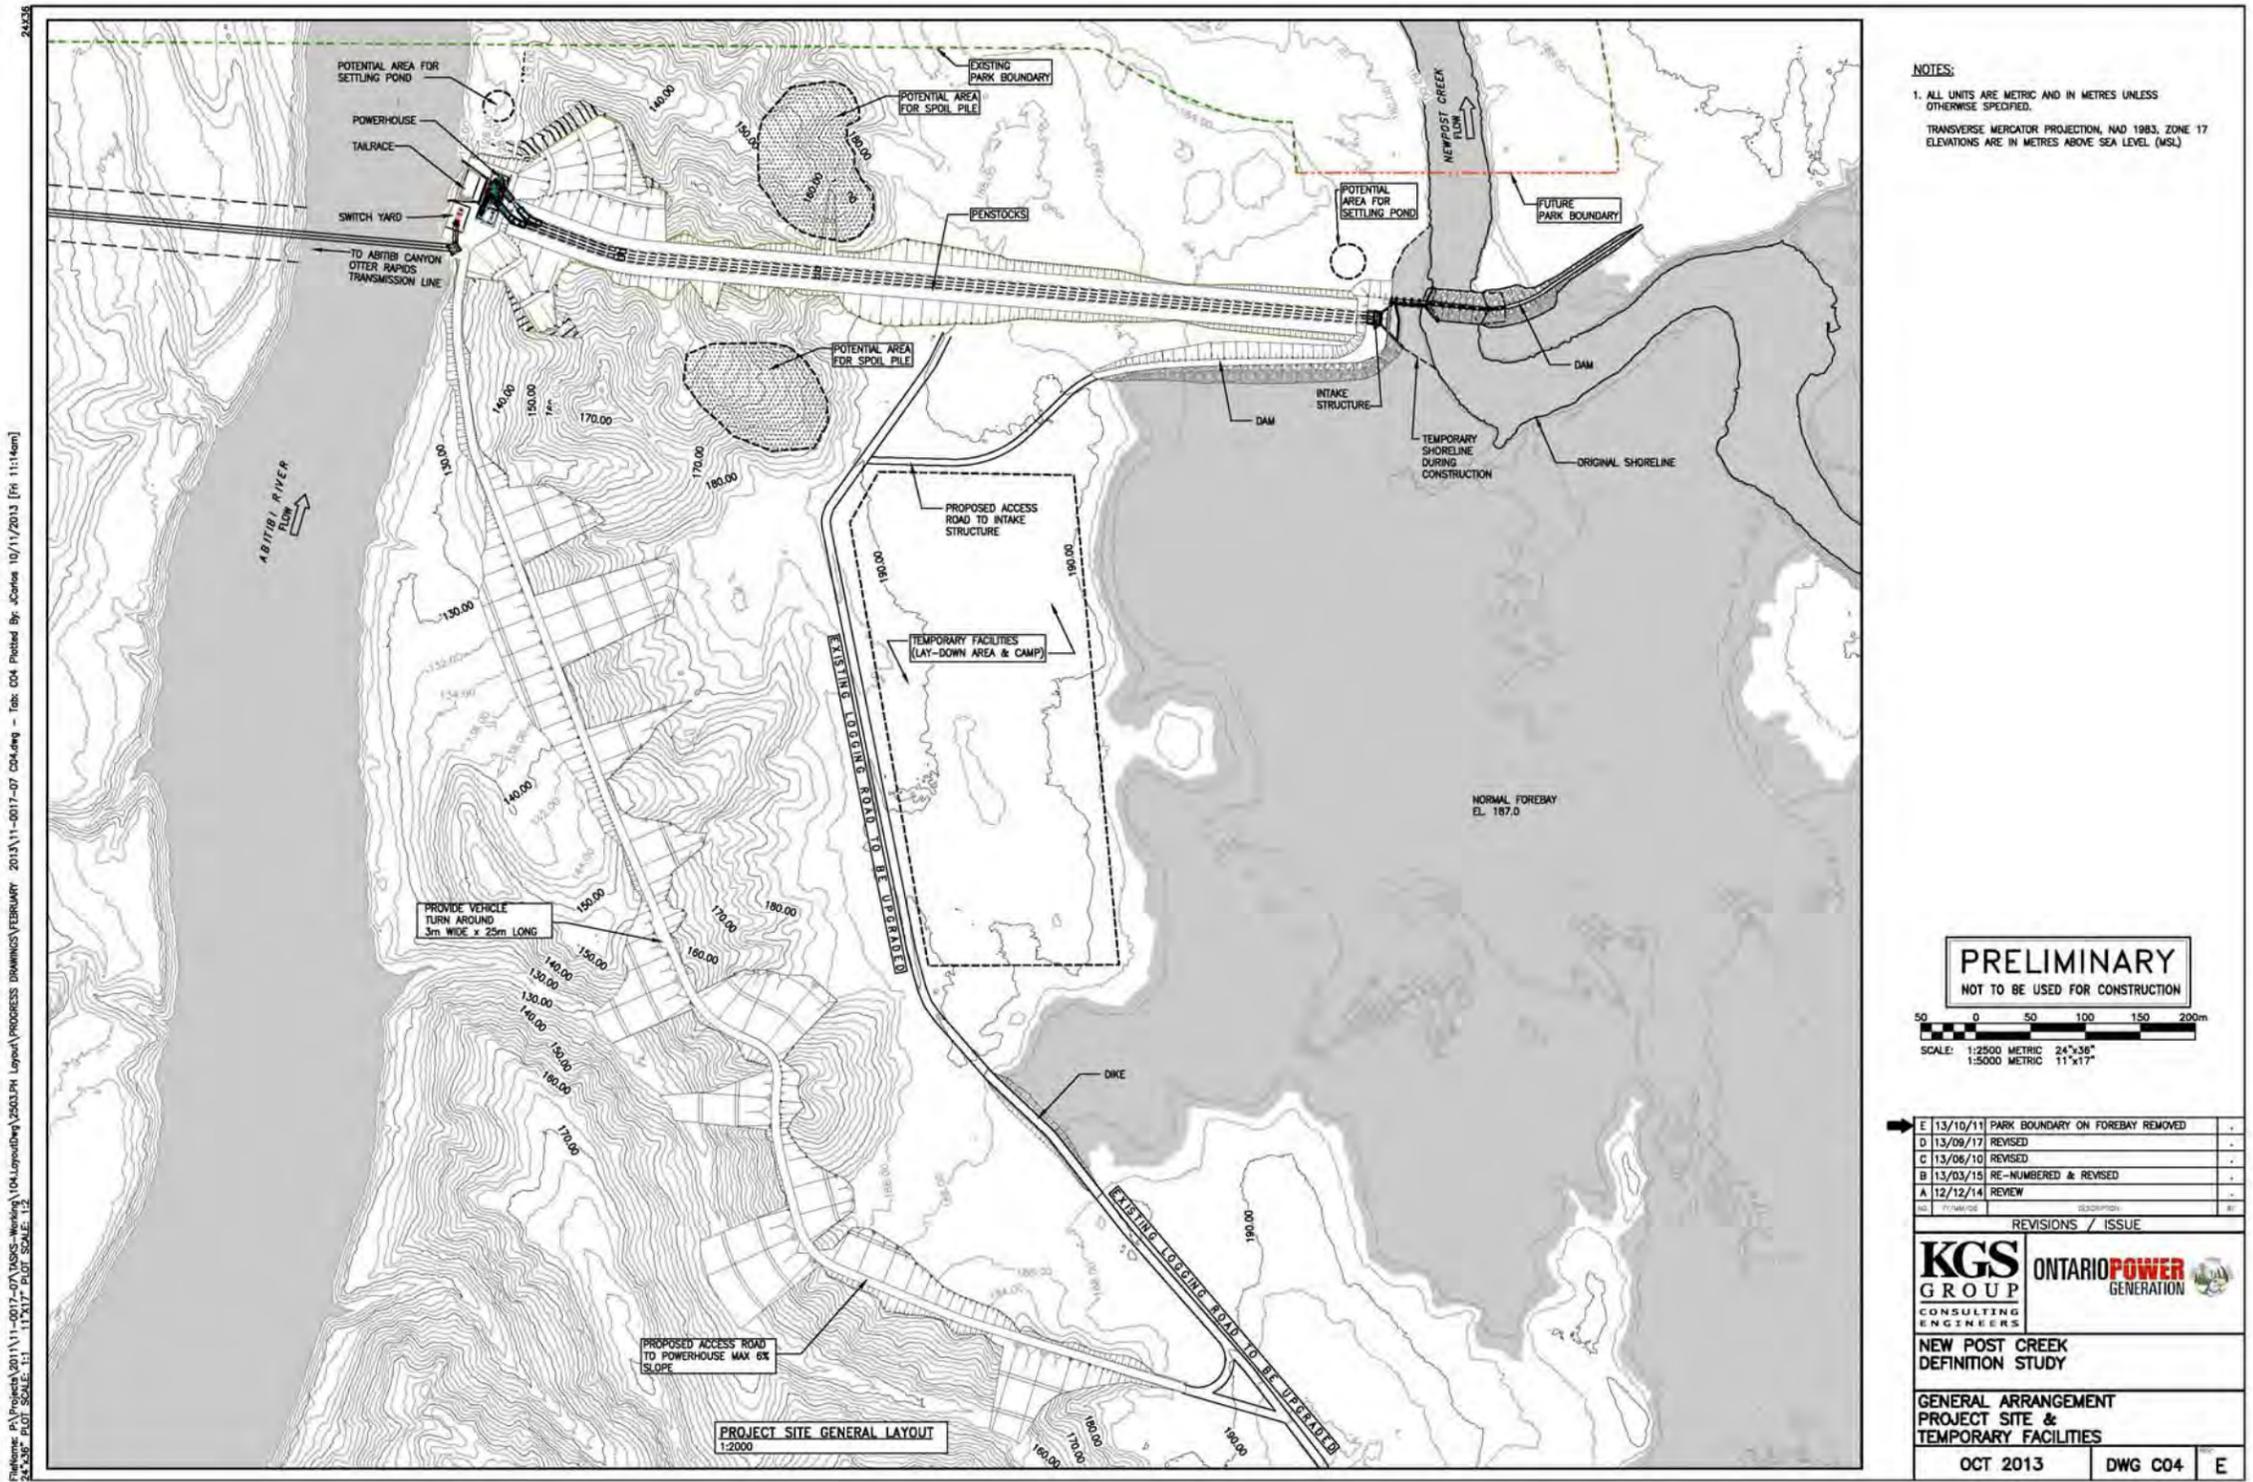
Project Location, Site Area Plan and Transmission Line Route¹
